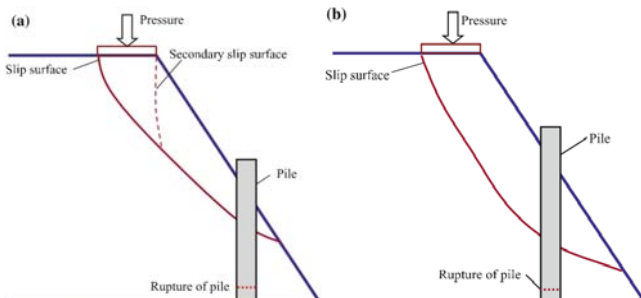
Failure configuration of slope and piles for piles located at (a) toe, (b) mid-slope (after Wang and Zhang (2013))
